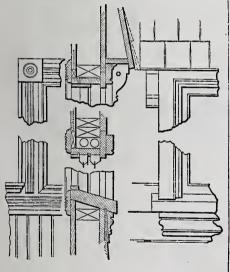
Exterior and Interior Details of Windows.-Scale, 3/4 Inch to the Foot.
